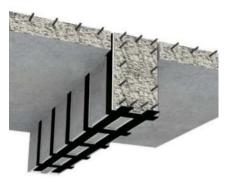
Reinforcement of Reinforced Concrete Roofing Coil with Composite Ribbon
